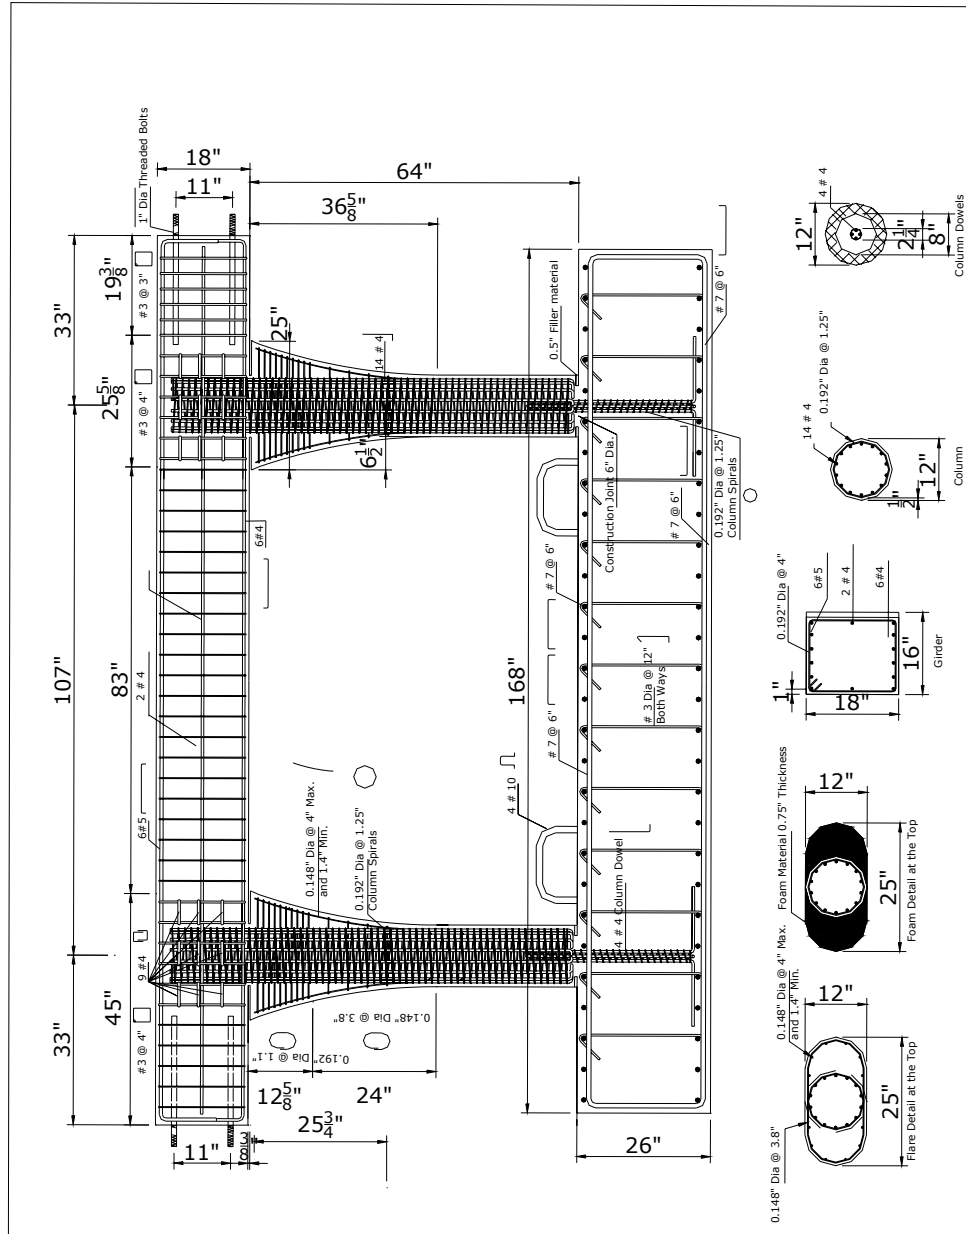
Reinforcement Details of LFC D1S (English Units)
